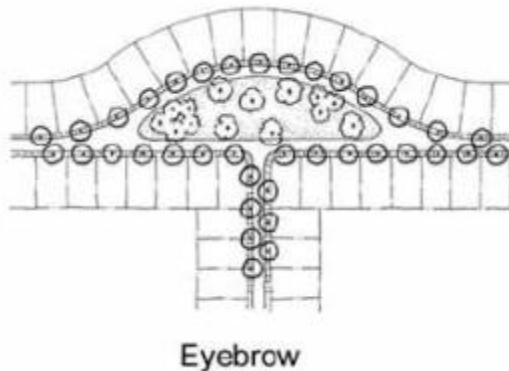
Illustration of a street eyebrow with street trees.
